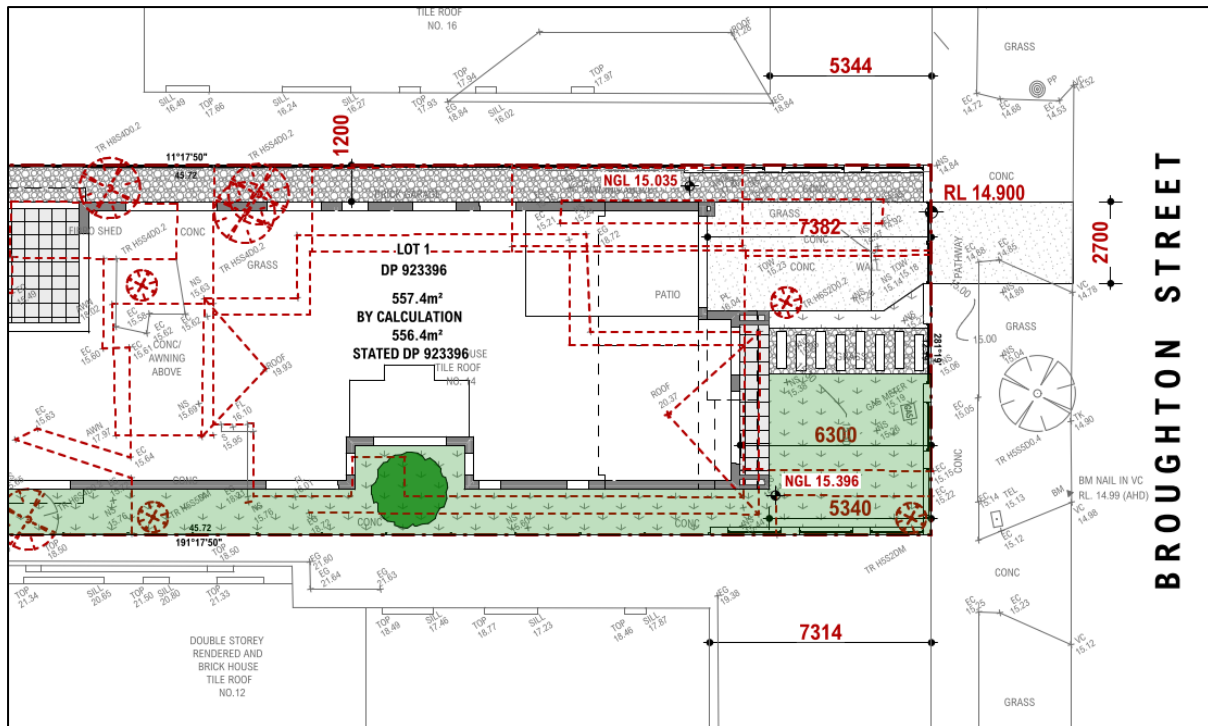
Revised proposal showing dwelling now more closely aligning with adjoining dwellings and that of the original dwelling's footprint.
